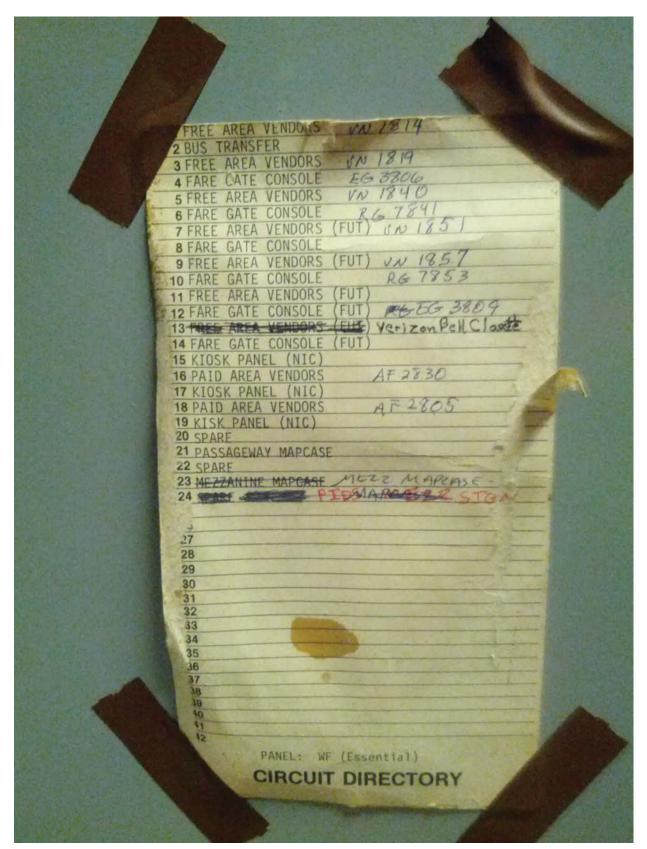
E03 U Street West - AFC Panel WF in Room 212
